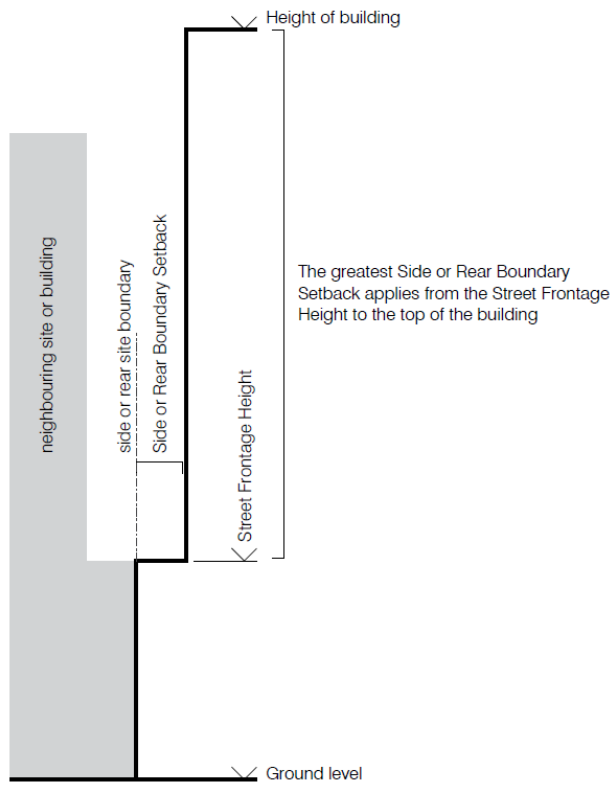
Minimum Side or Rear Setbacks above Street Frontage Height applied consistently to the top of the building not varying in cross section
